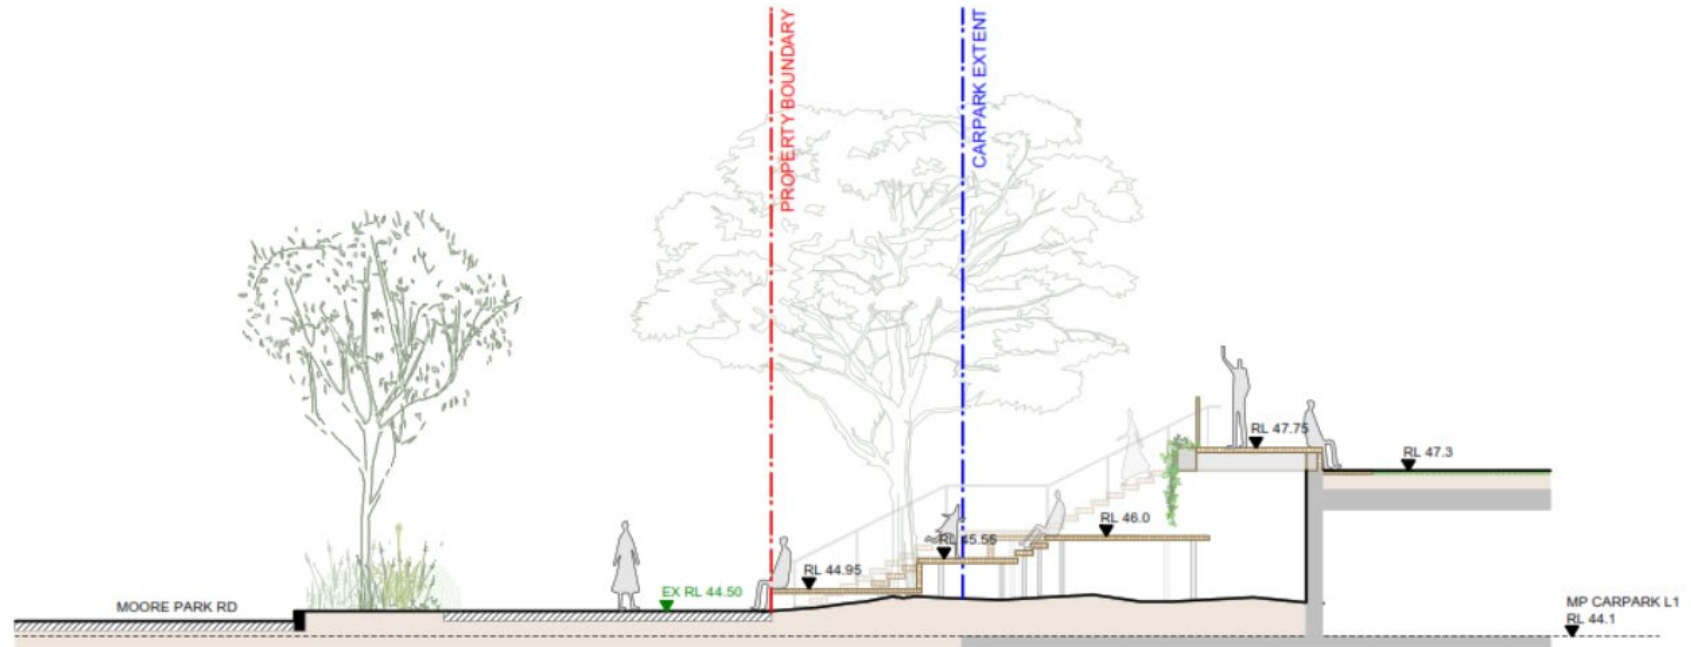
Cross Section and elevation at Moore Park Rd, view east
